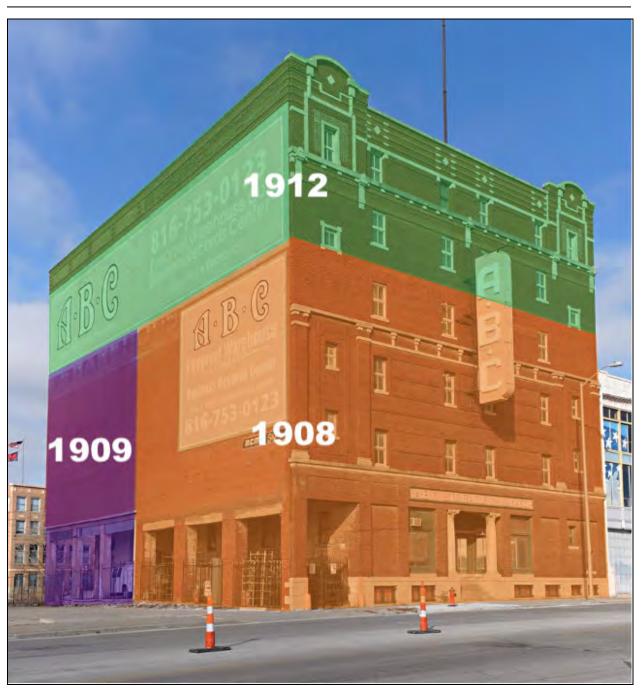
Color-coded photograph with dates of construction for original building and additions. The original 1908 building is denoted by orange, the 1909 addition by purple, and the 1912 addition by green.
